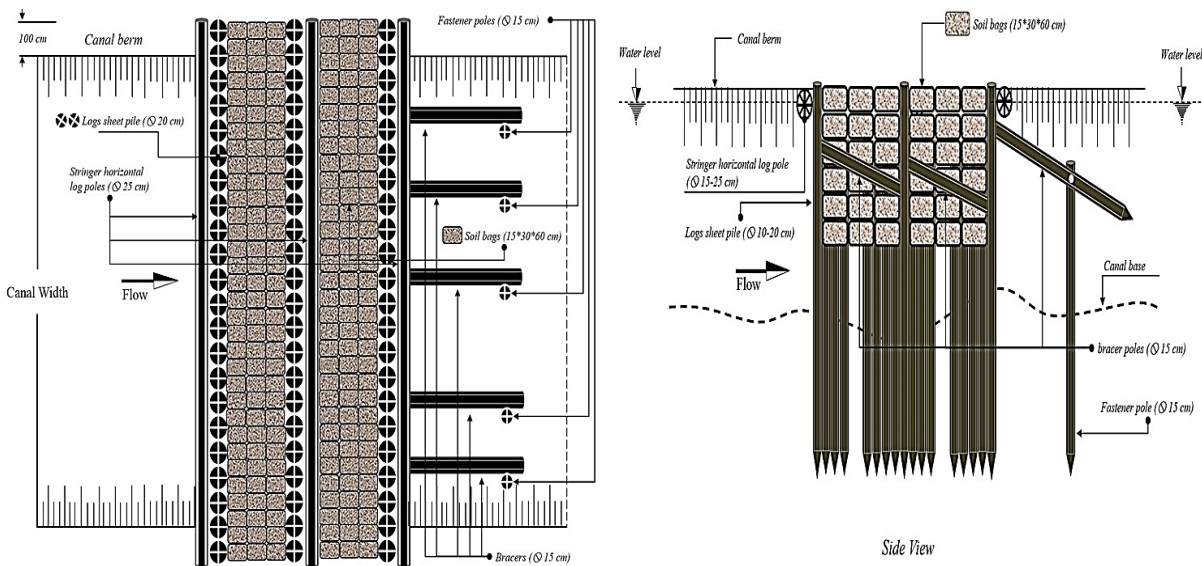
Three sheet pile box dam (CCFPI Dam Model 1)
